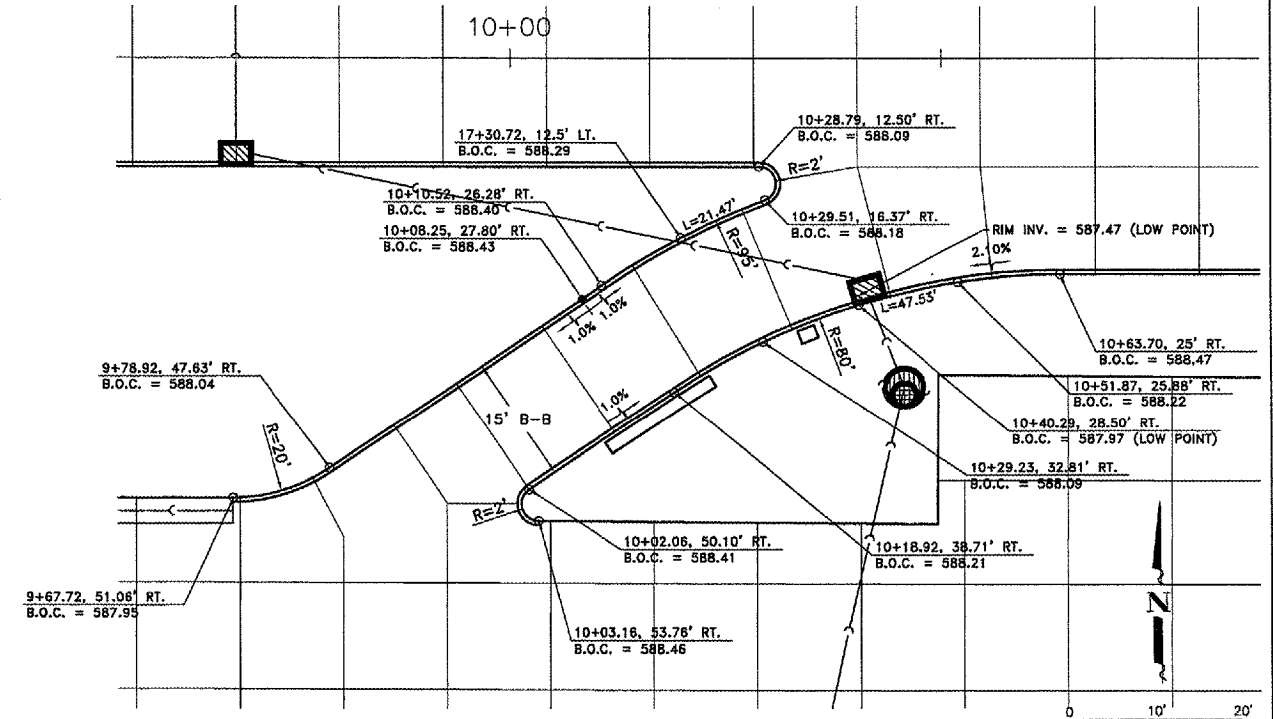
DETAIL - ENTRANCE ROAD & OLD ENTRANCE ROAD INTERSECTION
